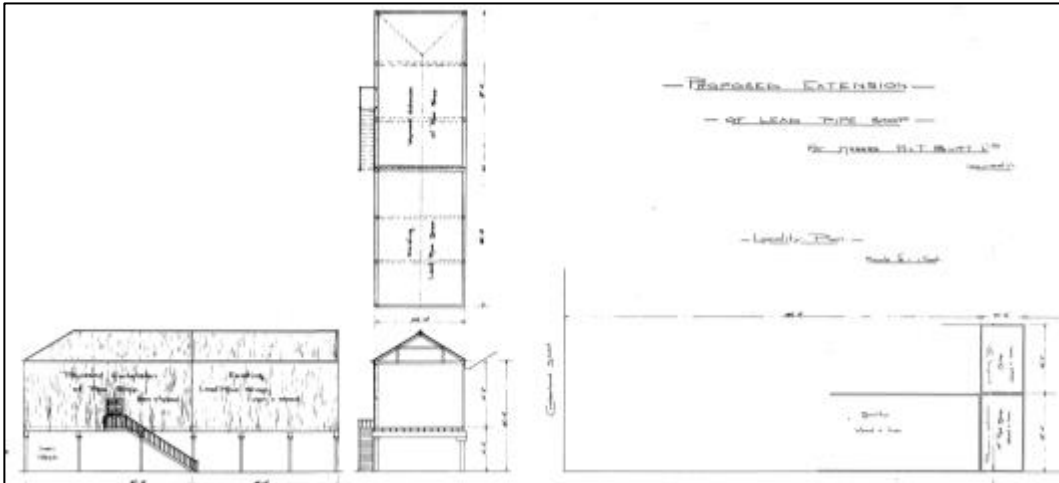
1911 plans for second addition to the lead pipe shop (DCC Archives).
